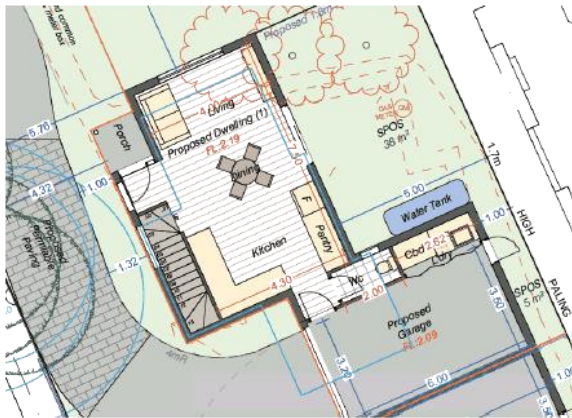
Example layout for dwellings 1-4, with laundry incorporated into the garage layout
